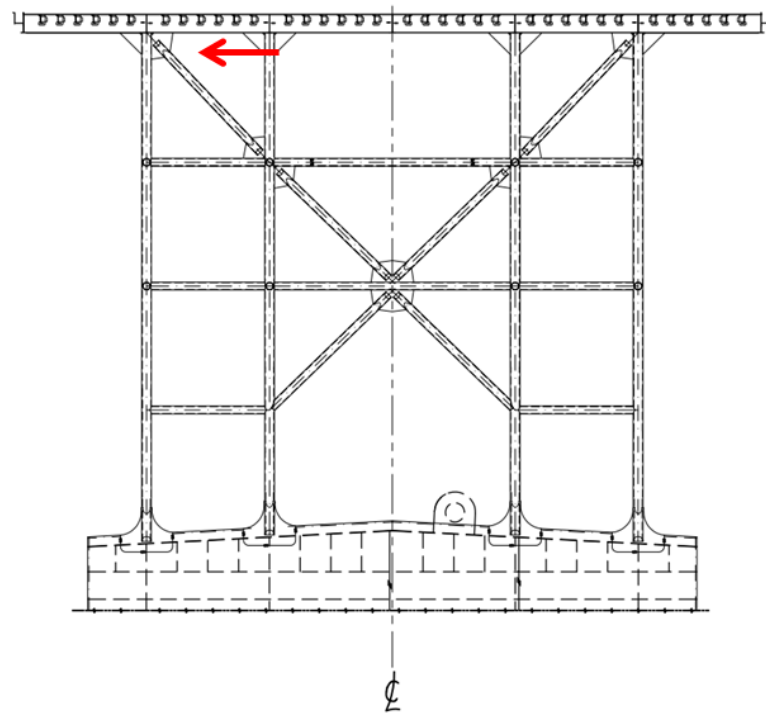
Transversal view of helideck platform and support structure. Selected Gusset connection detail presented with the red arrow.
